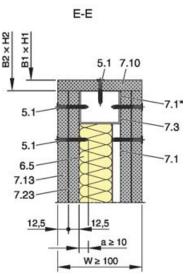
Compartment wall with metal support structure and cladding on both sides
